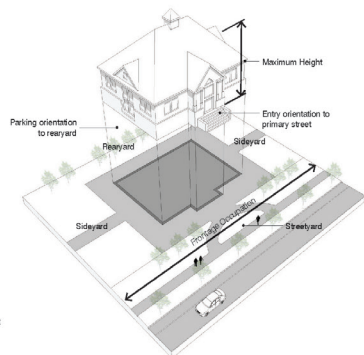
BUILDING AND SITE TYPES
